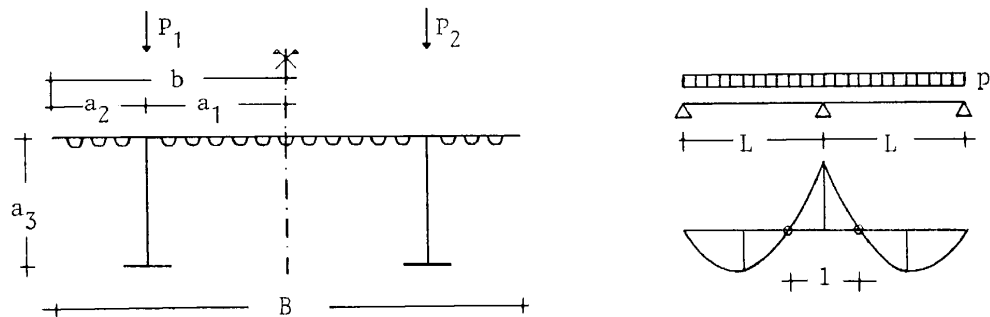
Cross-section and longitudinal system of a highway bridge.
